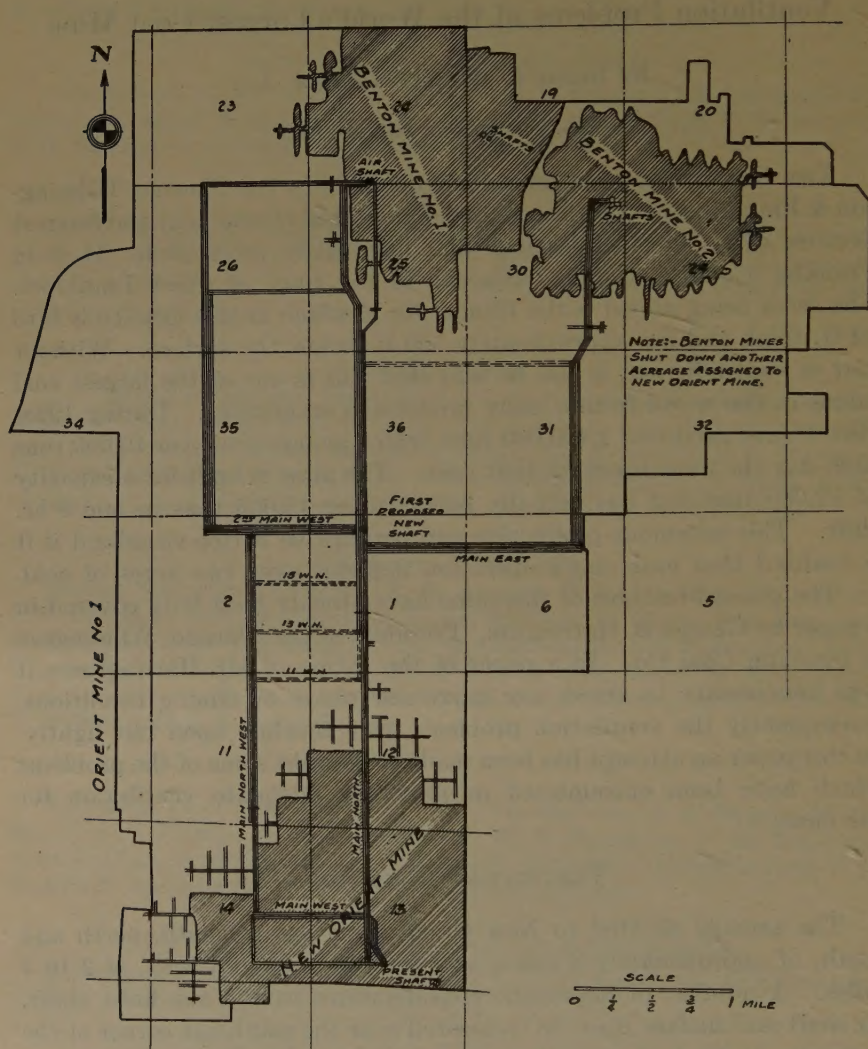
PROPOSED METHOD OF VENTILATION, NEW ORIENT MINE.
